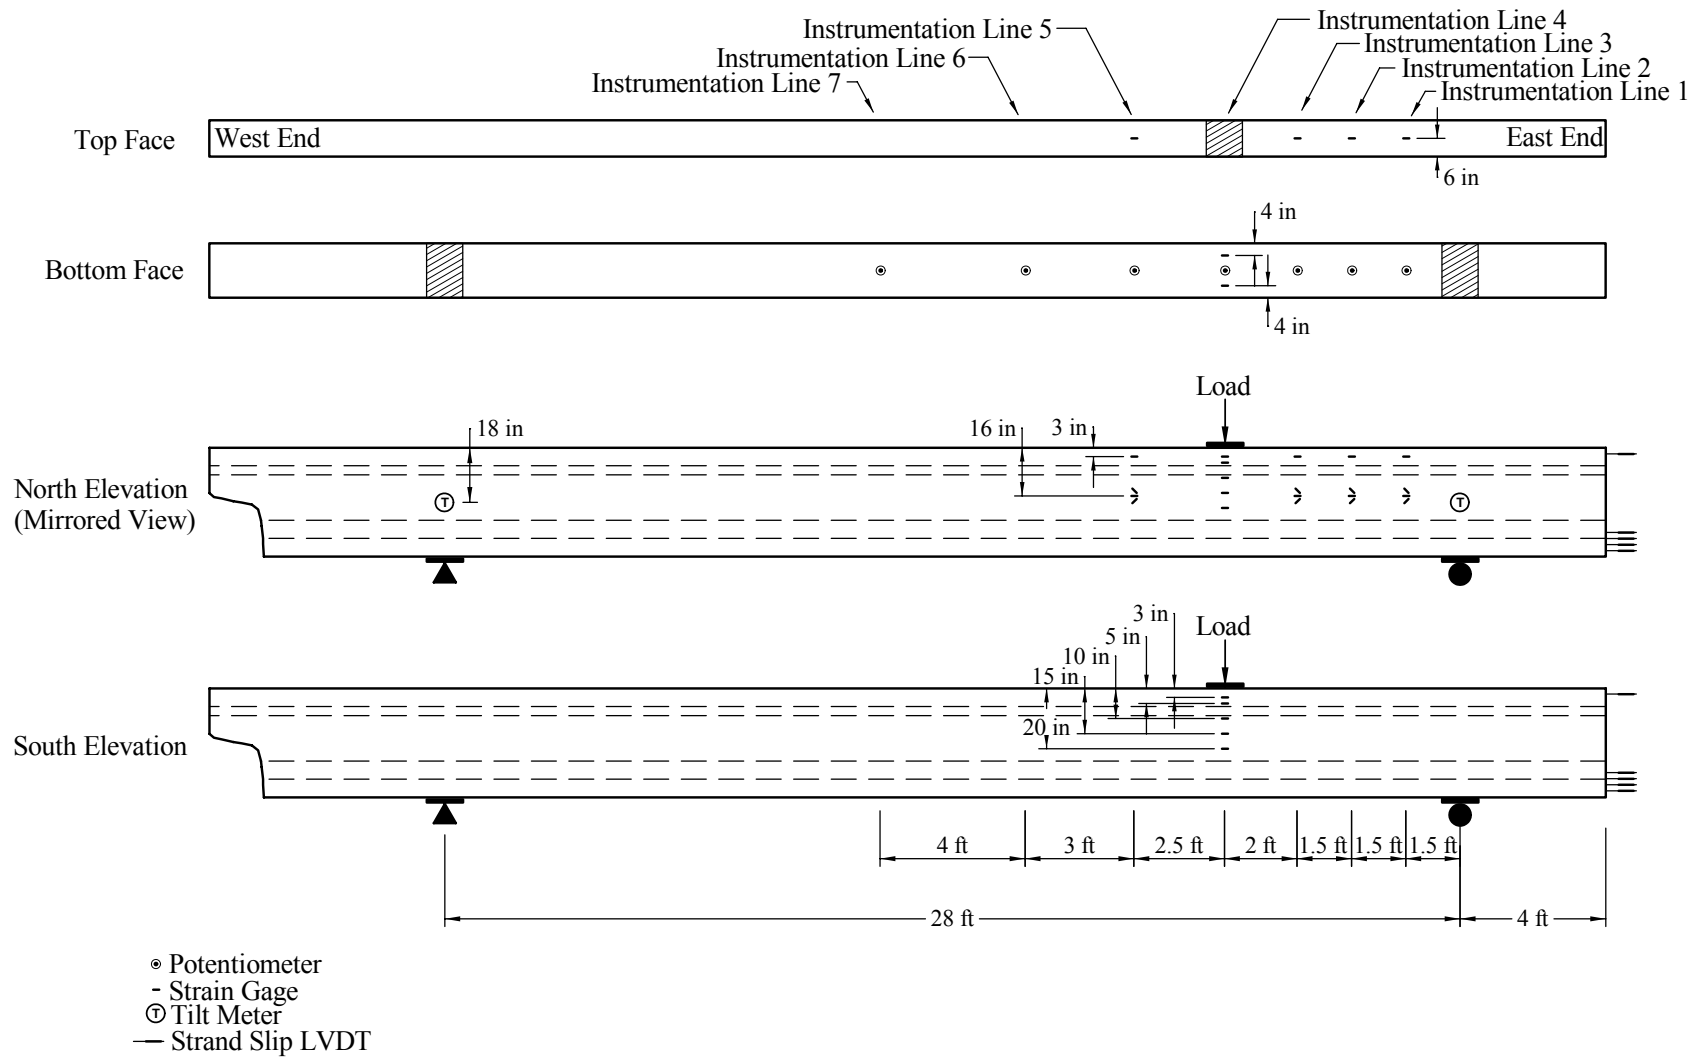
A: Instrumentation plan for Girder 28S
